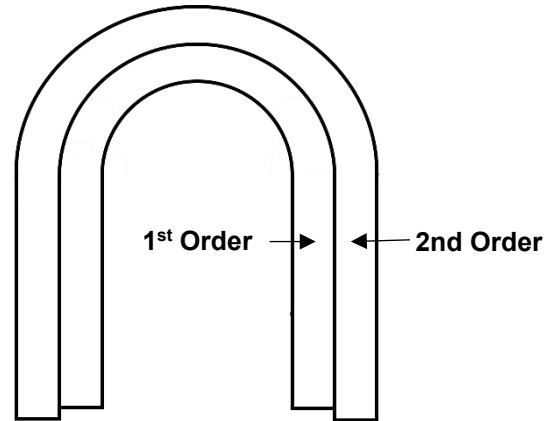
Concept of Orders in Norman Style Windows & Doors
